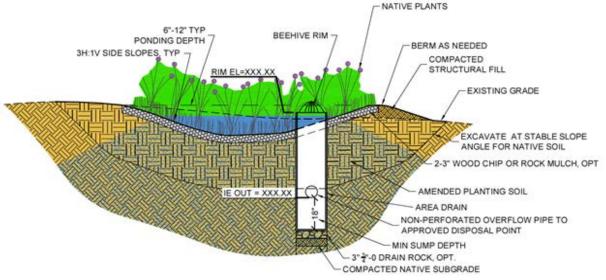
An example of an "Infiltration Rain Garden with Planting Soil and Area Drain". Not pictured, but also applicable to the above criteria are versions of a stormwater planter or LID swale (see Appendix F Standard Details).
